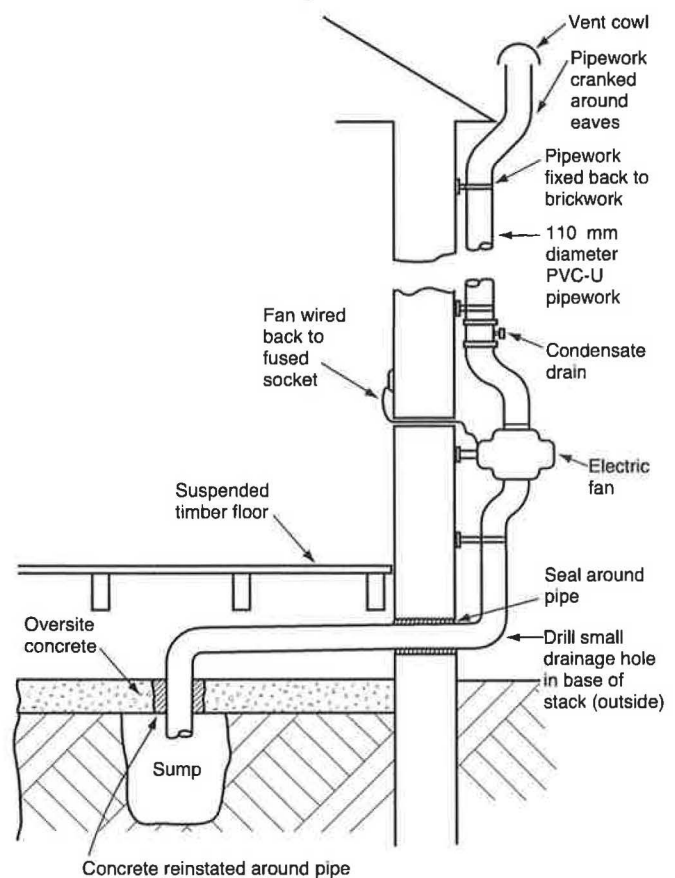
A mini-sump under concrete oversite with external fan and ductwork
